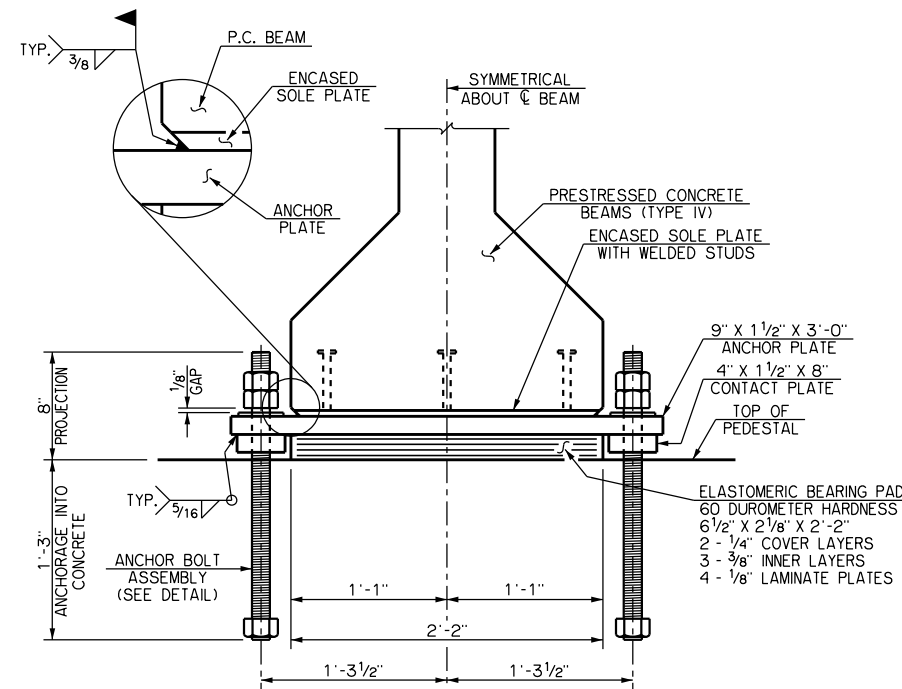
DETAILS OF BEARING ASSEMBLY WITHIN SPAN NOS. 1 AND 3
